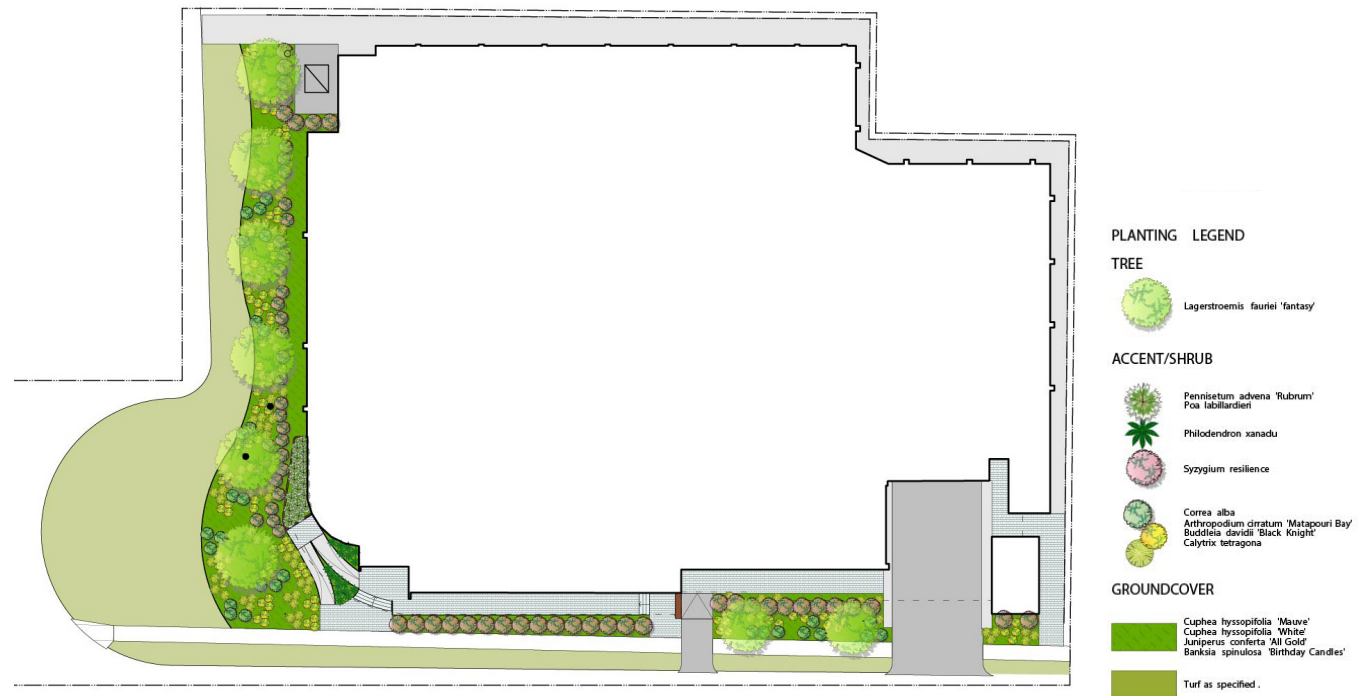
Proposed Landscape Plan (Moir Landscape Architects)
